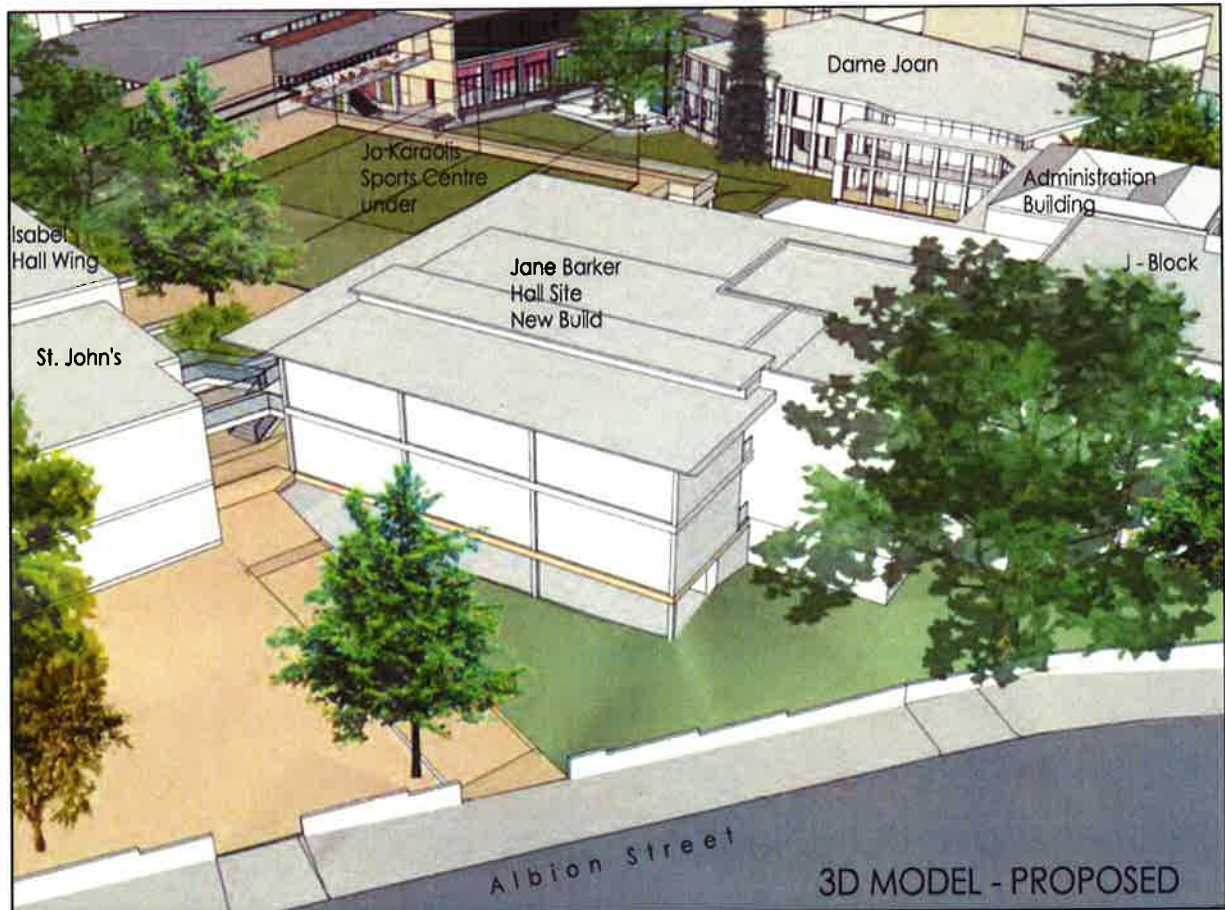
Stage 2 JBH building envelope - New TAS and Science Block
